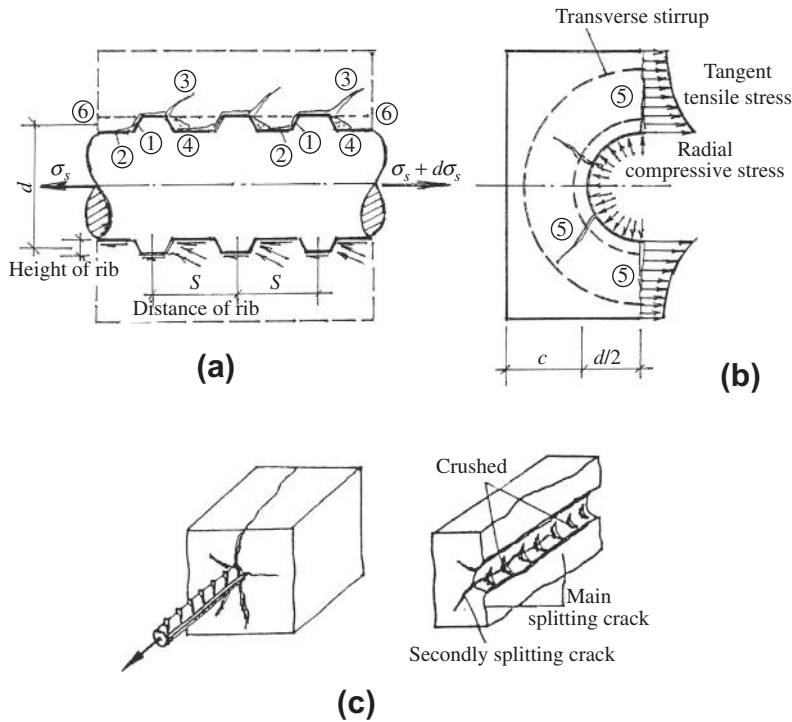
Development process of internal cracks and bond failure of specimen with deformed reinforcement [7-2]: (a) longitudinal direction, (b) transverse section, (c) failure pattern
